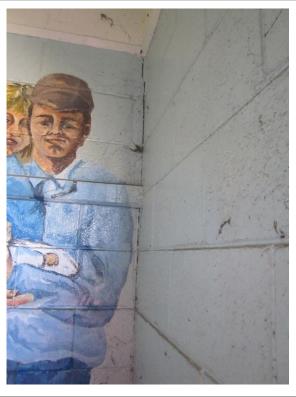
Step cracking along mortar joints on the east wall.
